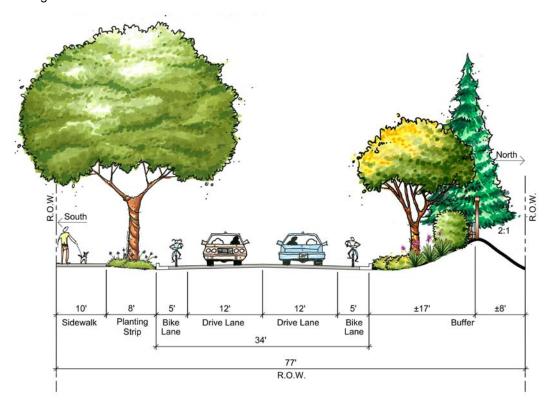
'D' Street - Buffer Road - Section
